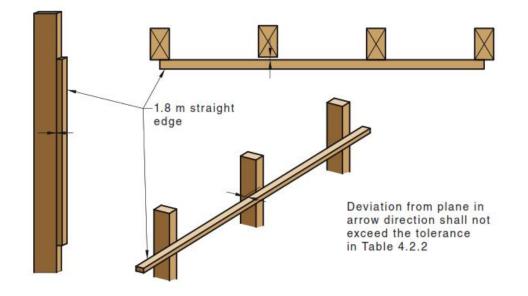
(A) ASSESSING FRAMING TOLERANCE
